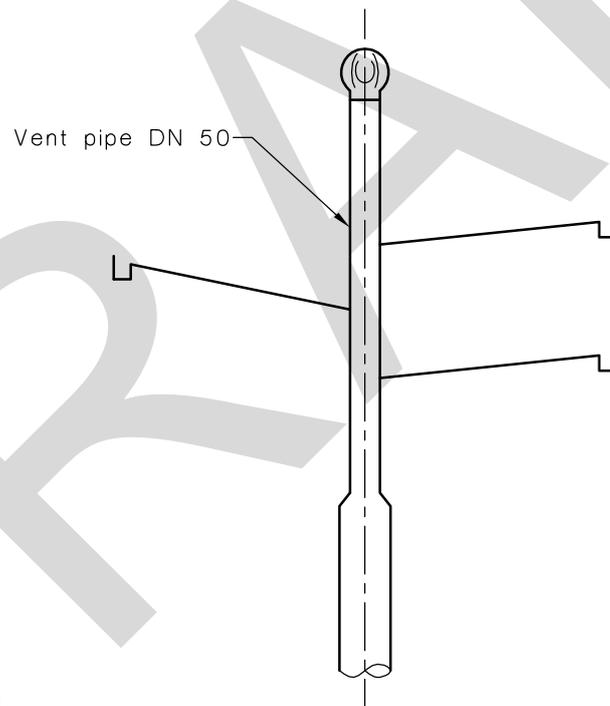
TYPICAL CONNECTION OF WASTE FIXTURES TO A DN 50 VERTICAL SECTION OF STACK
